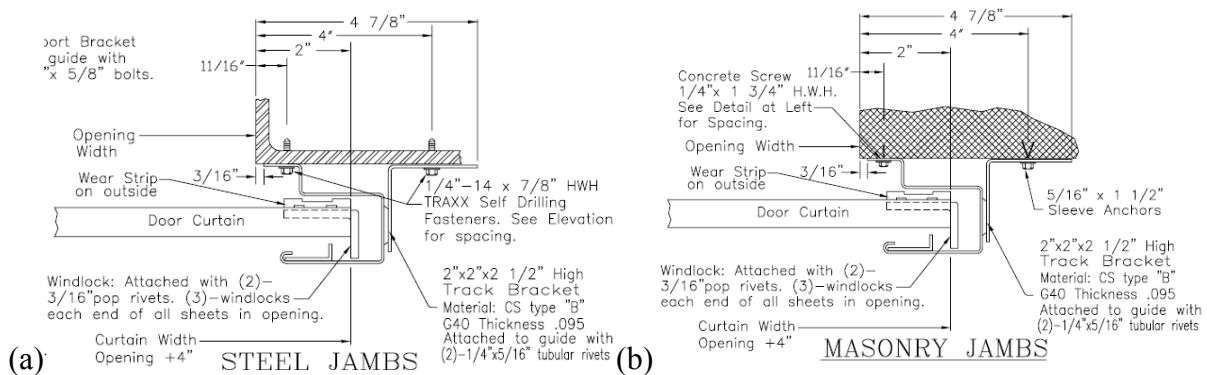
Door jamb details - (a) hot-rolled steel and (b) masonry (Allen 2008)
